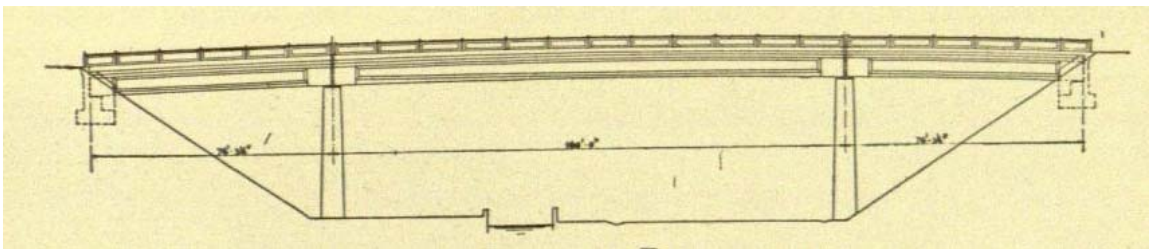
Walnut Lane Bridge Elevation (Magnel 1954)
